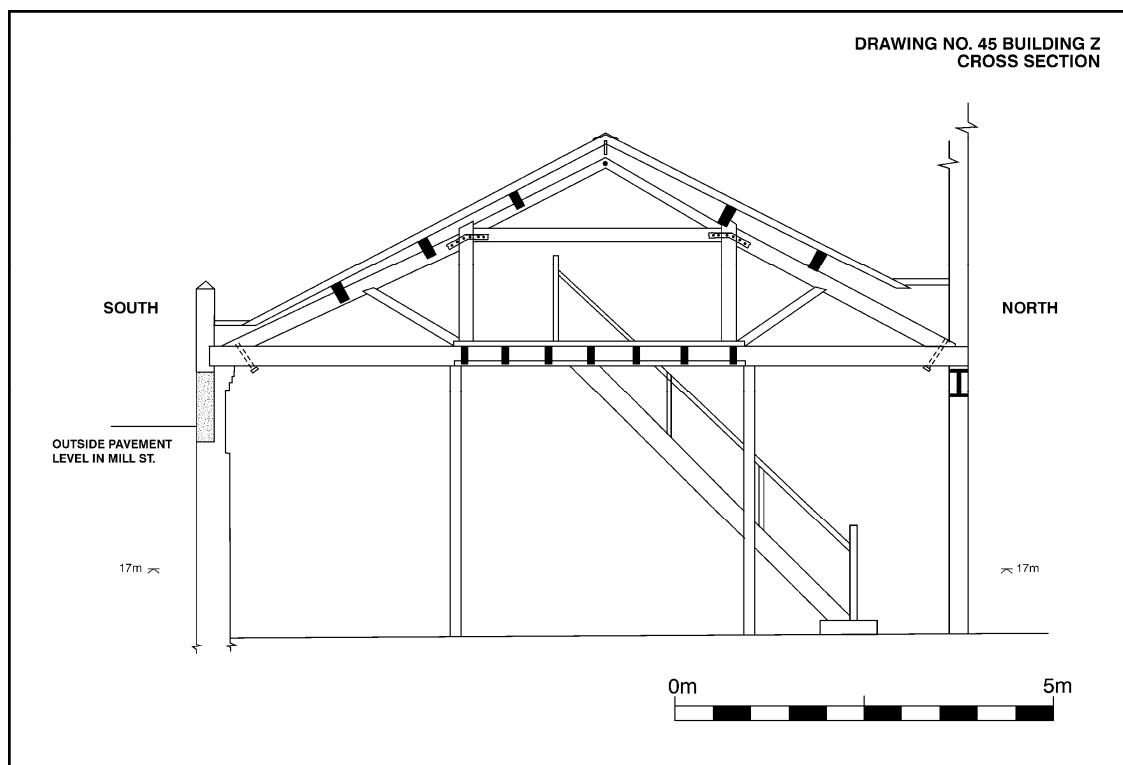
East facing cross-section of the New Mould Shed in Building Z (scale 1:100)
